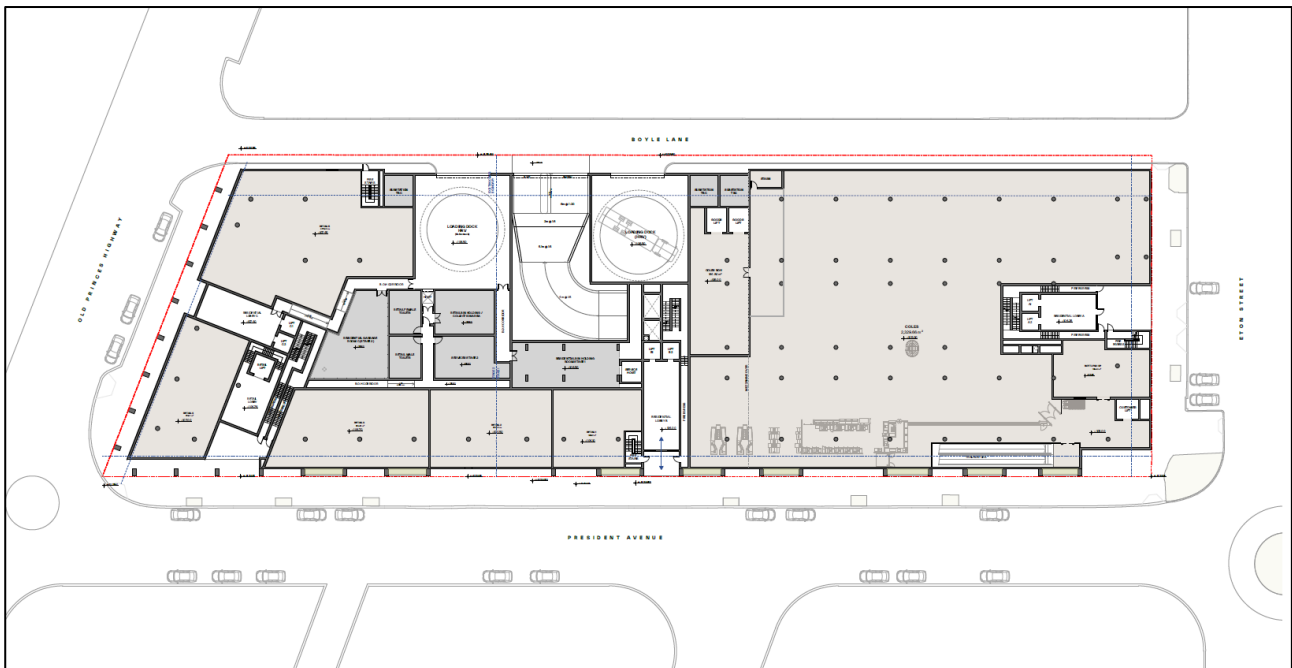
INDICATIVE GROUND FLOOR PLAN
